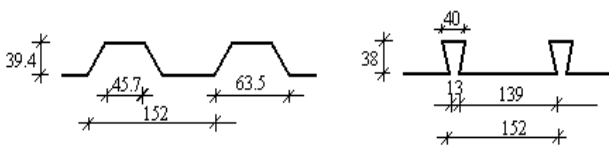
Cross section details of steel sheet cycles . All dimensions in (mms).
